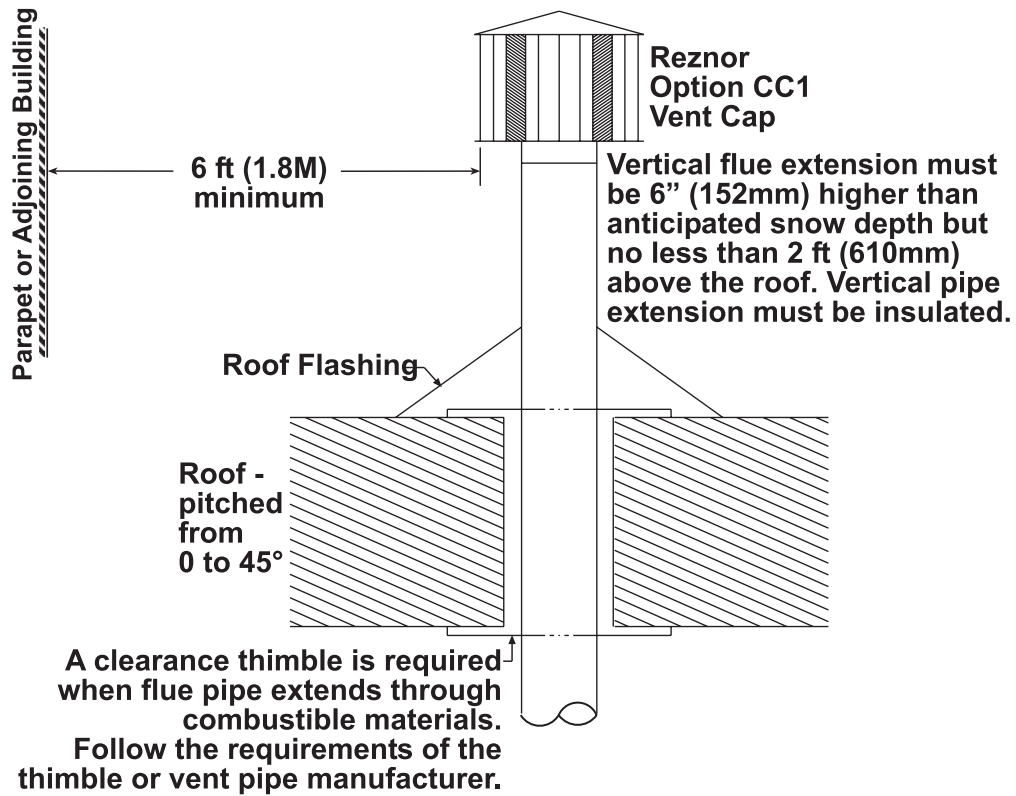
Vertical Vent Termination—Single-Wall Vent Run and Single-Wall Terminal End
